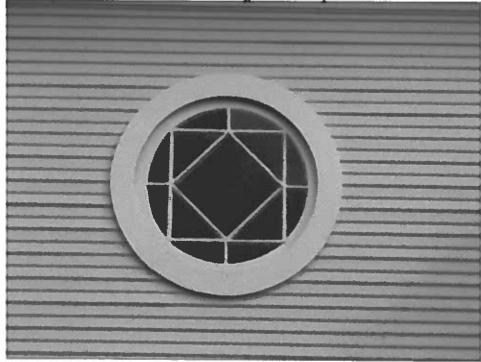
2nd floor round window to the middle room. This window is not designed to be opened.
